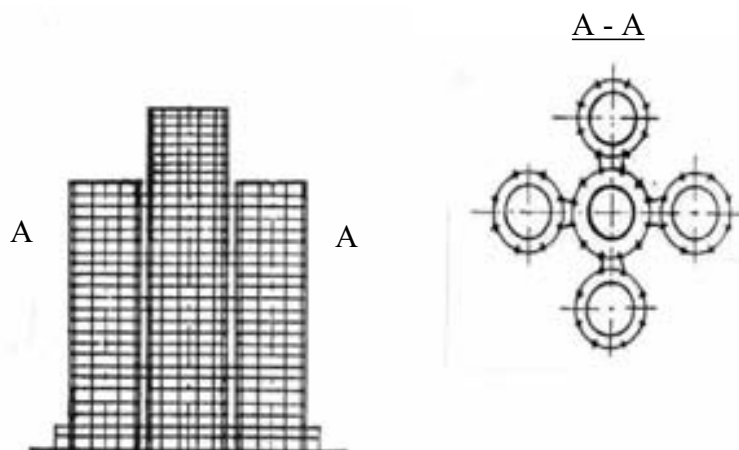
Constructional scheme of the building of the “Bonaveture” hotel in Los-Angeles.
